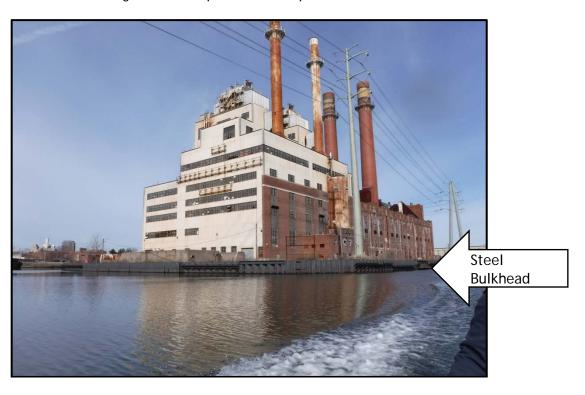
Steel bulkhead along Ball Island south of Grand Avenue, looking northwest, photo taken February 19, 2016.
